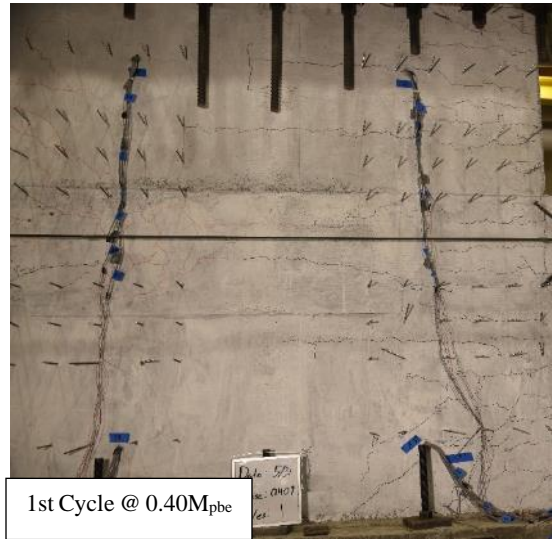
Wall Damage Photos for SRC-W2
